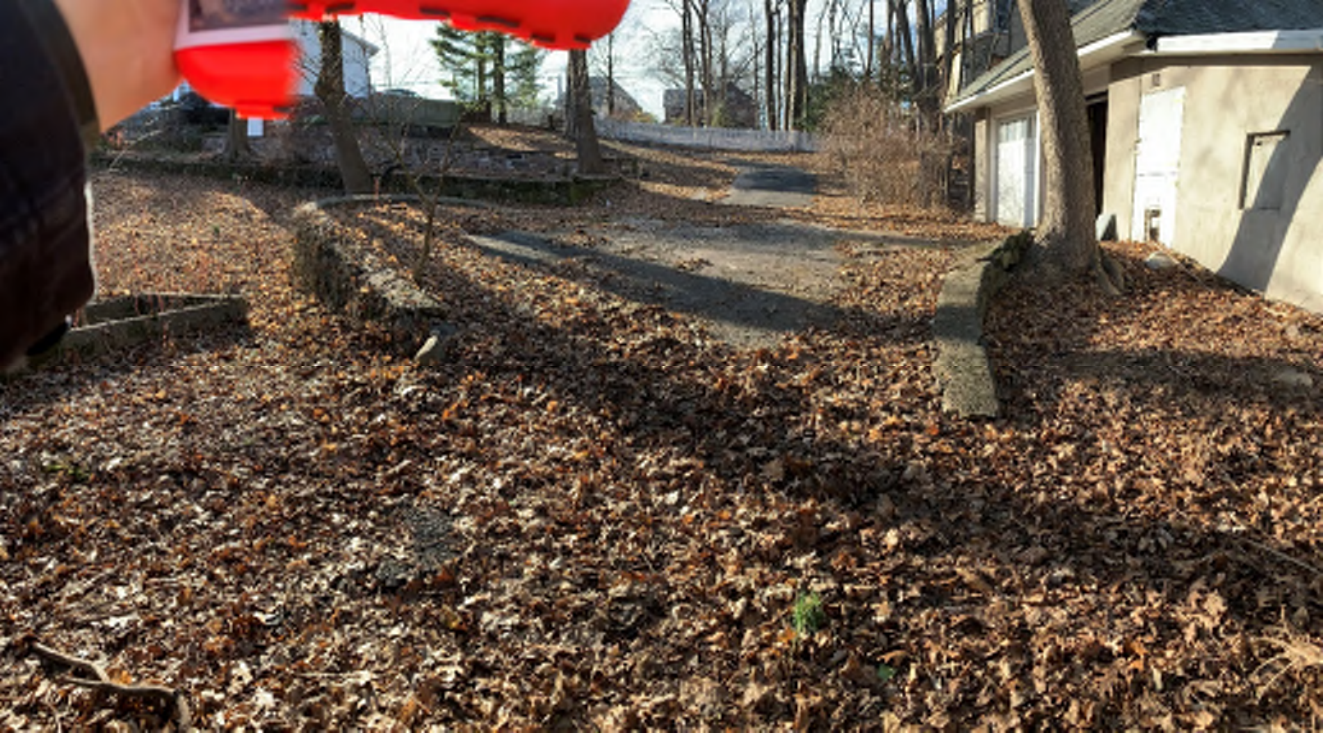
View of gate and stone wall along street right-of-way ling of 509 Park Street, Montclair, New
